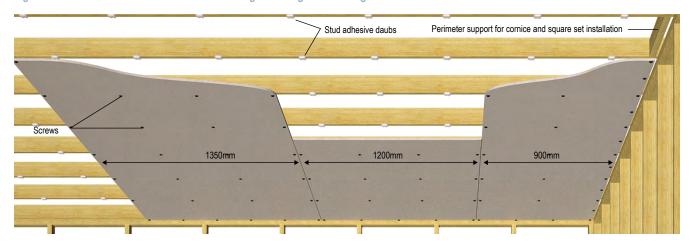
Combination Adhesive and Screw Fixing to Ceilings – Conventional Method
